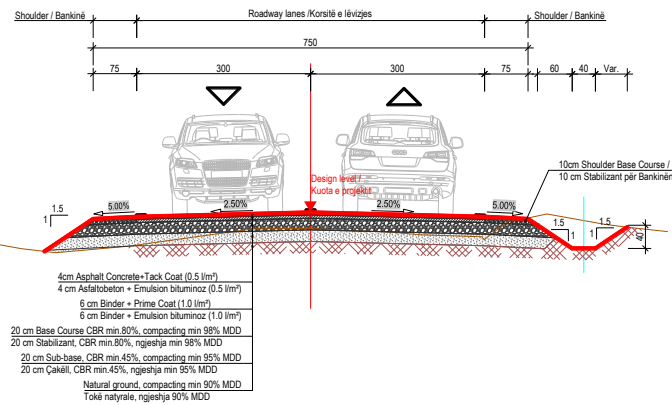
Typical Cross section No. 2 - Local Road "F2" (New Rural Road)
